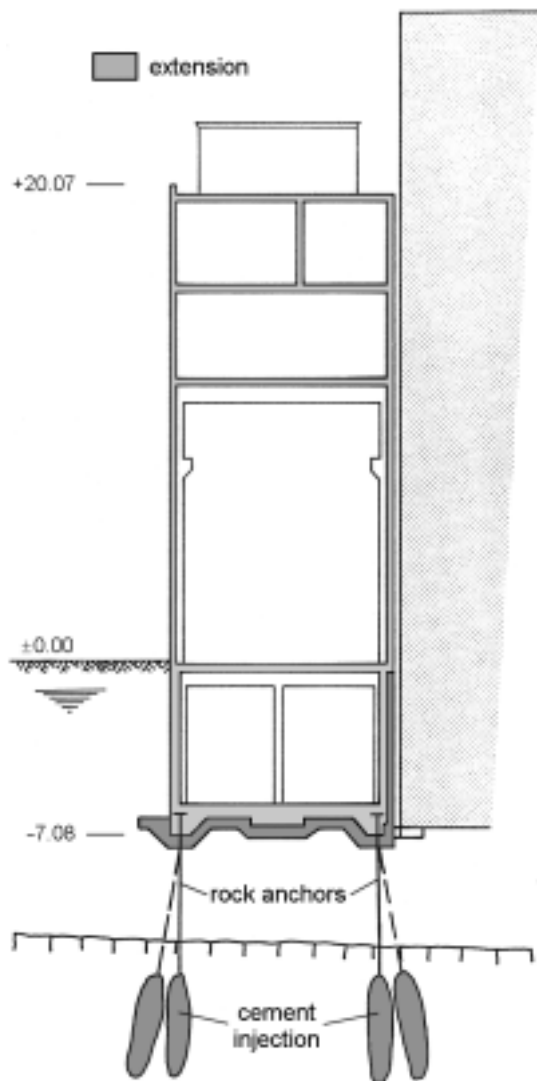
Cross section through the extension of the KKM turbine building ([12])
